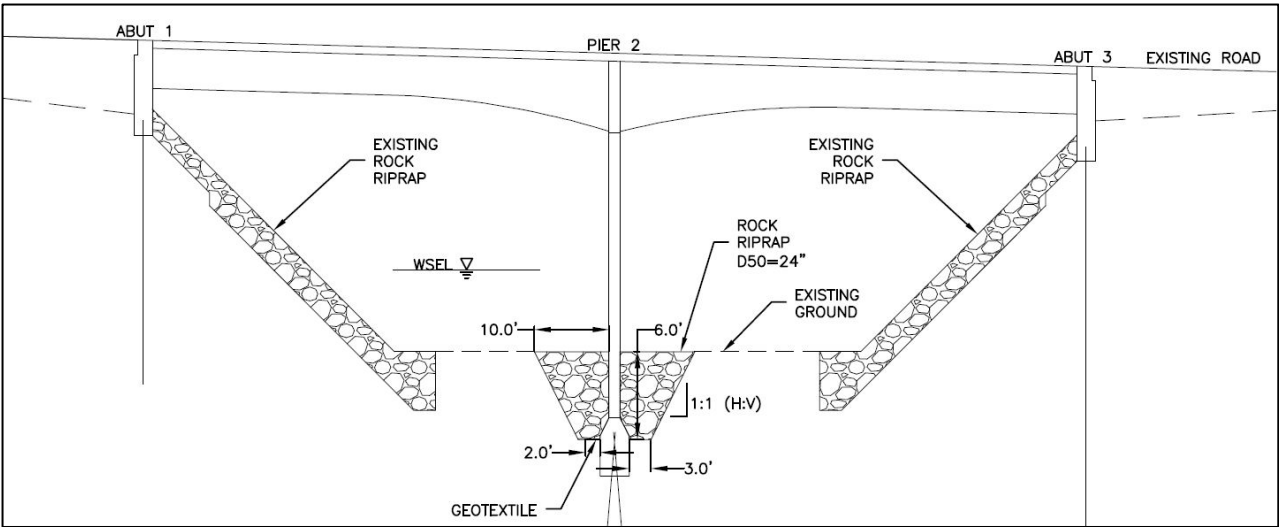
Cross-sectional view of Bridge H-04-Z with recommended hydraulic scour countermeasures
